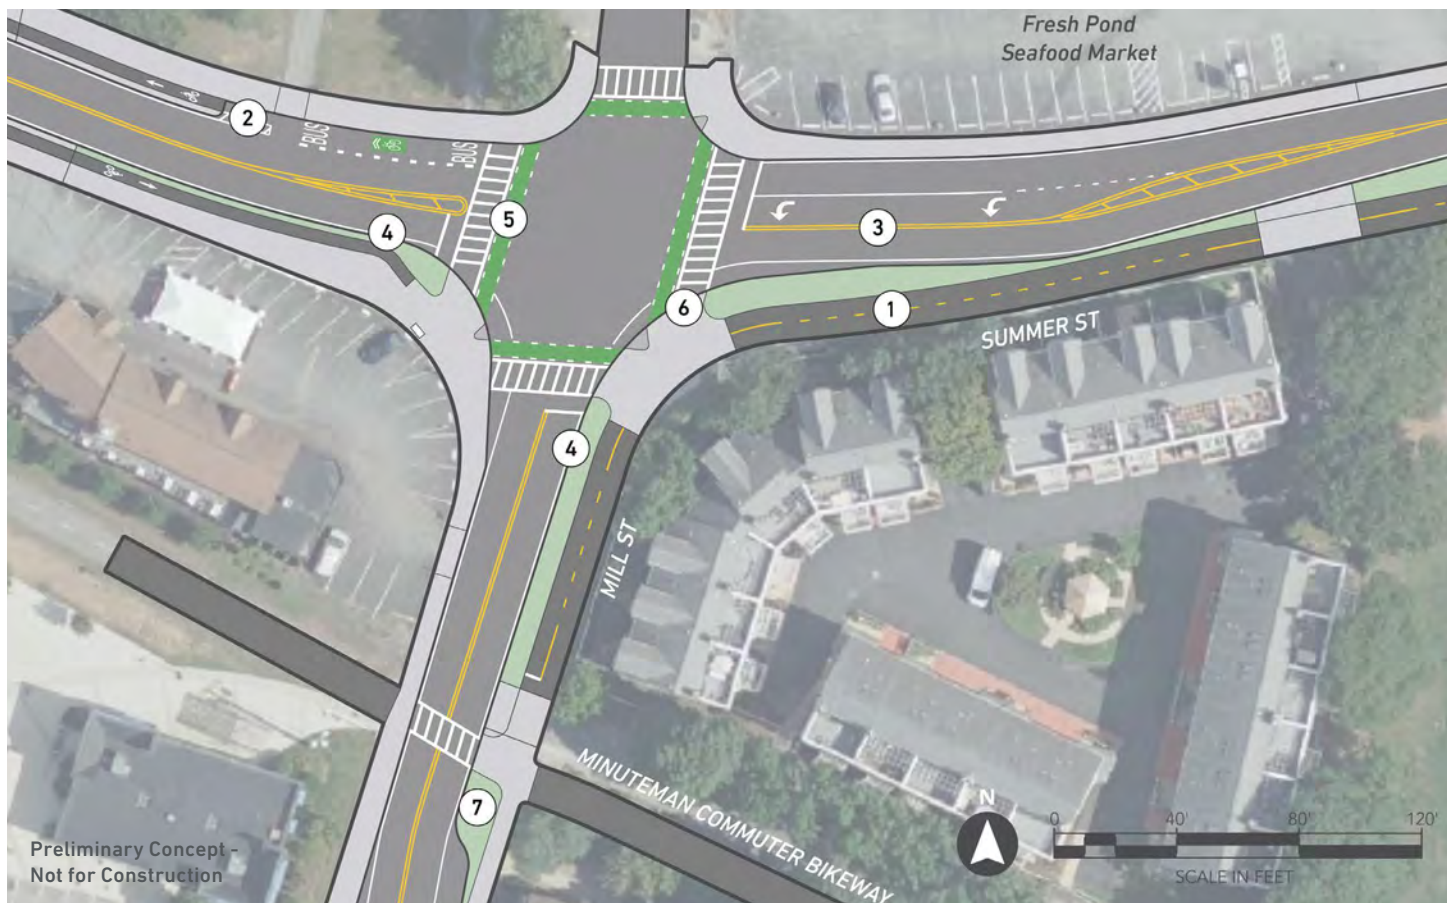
Proposal for Summer Street at Mill Street intersection south to the Minuteman Commuter Bikeway.
